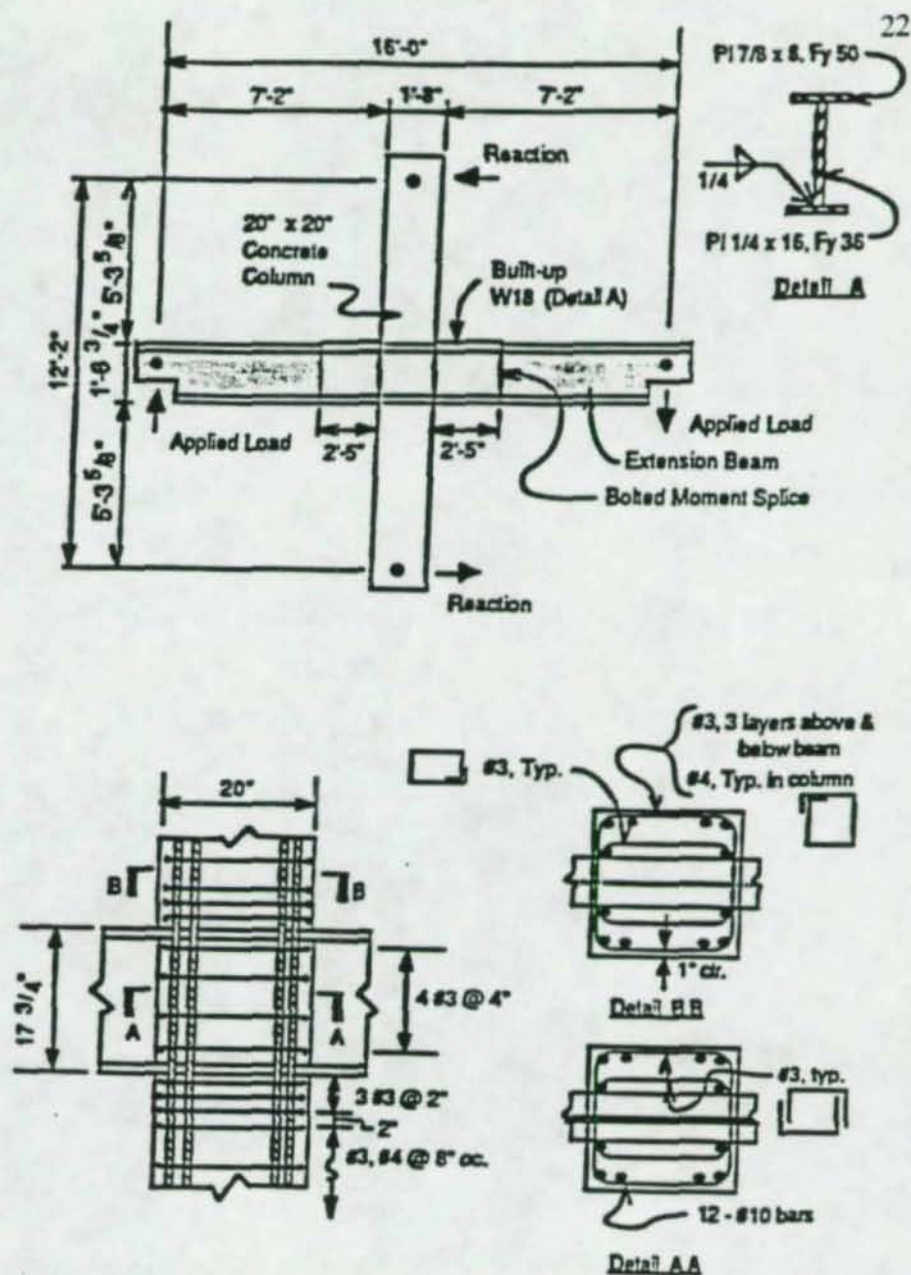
Typical test specimen and reinforcing steel details used by Dierlein<sup>(12)</sup>
